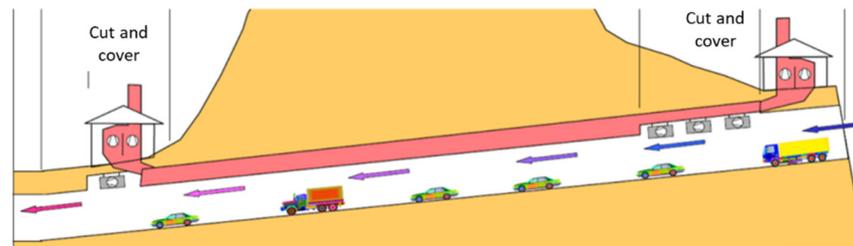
Layout of the 3rd Gubrist tunnel tube.
